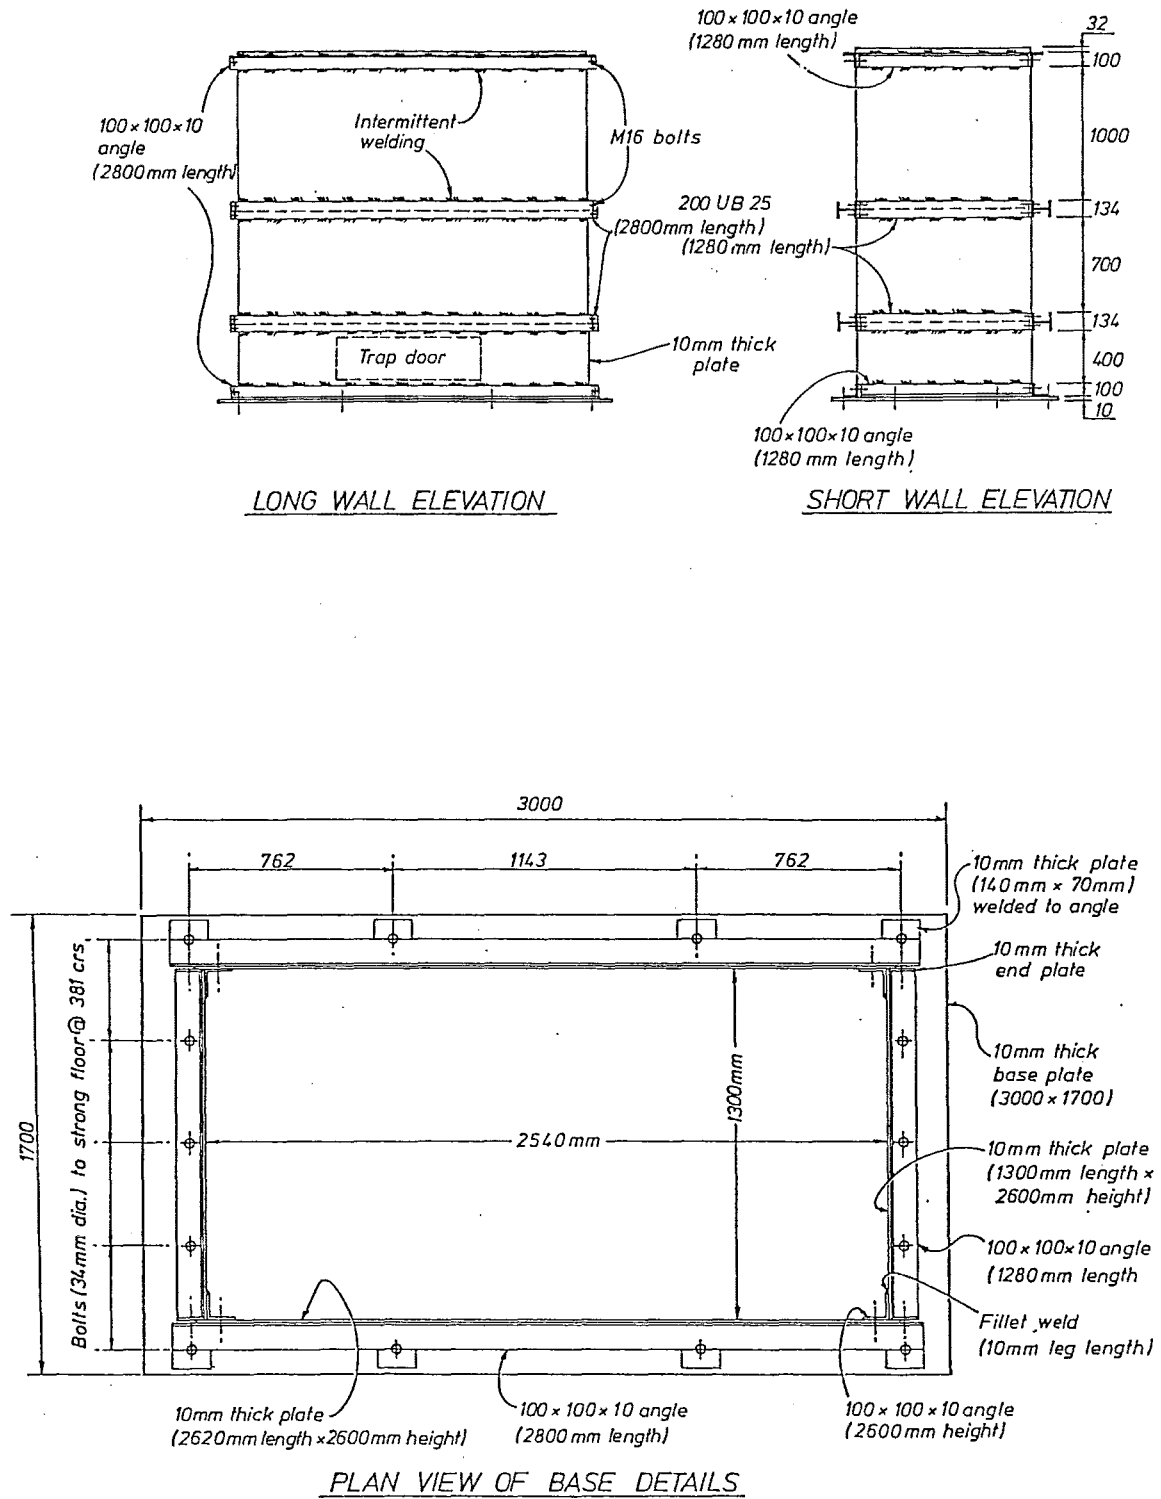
STRUCTURAL DETAILS OF STEEL RETAINING TANK
